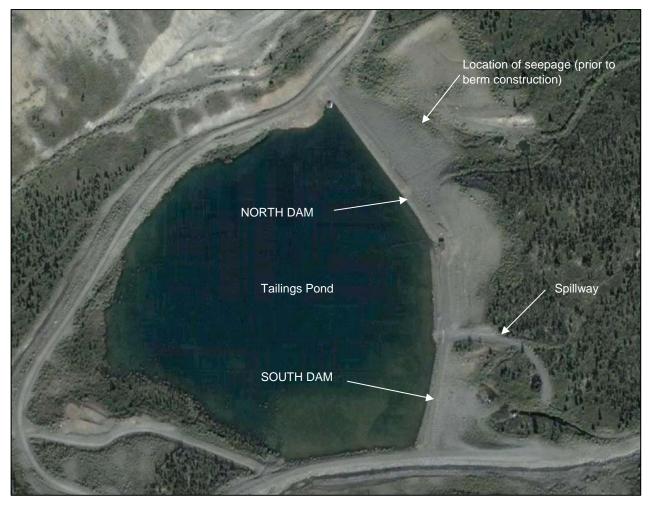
Tailings Impoundment and North Dam Prior to Toe Berm Construction
